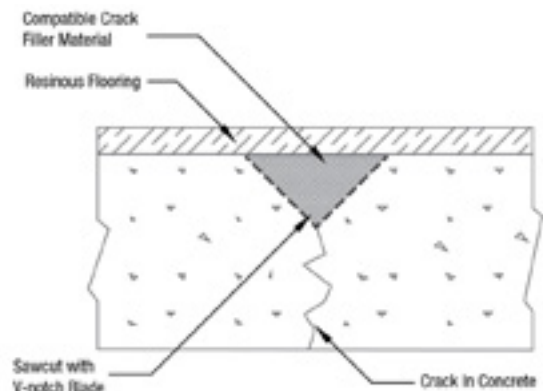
To repair static cracks, installers cut a V-notch around the damaged area to expand the bonding surface. This geometry improves adhesion between the filler and the concrete substrate, helping the repair hold up over time.
